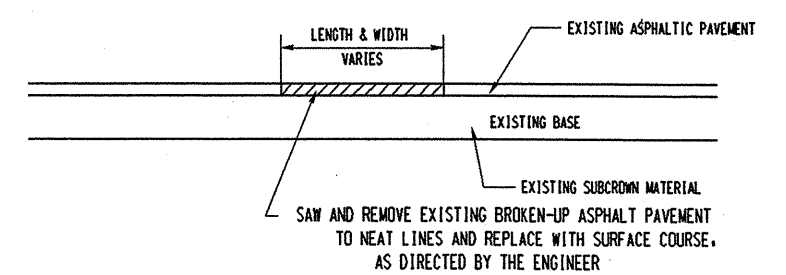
DETAILS OF PATCHING EXISTING PAVEMENT PRIOR TO RESURFACING FOR FULL DEPTH AND MILLING
